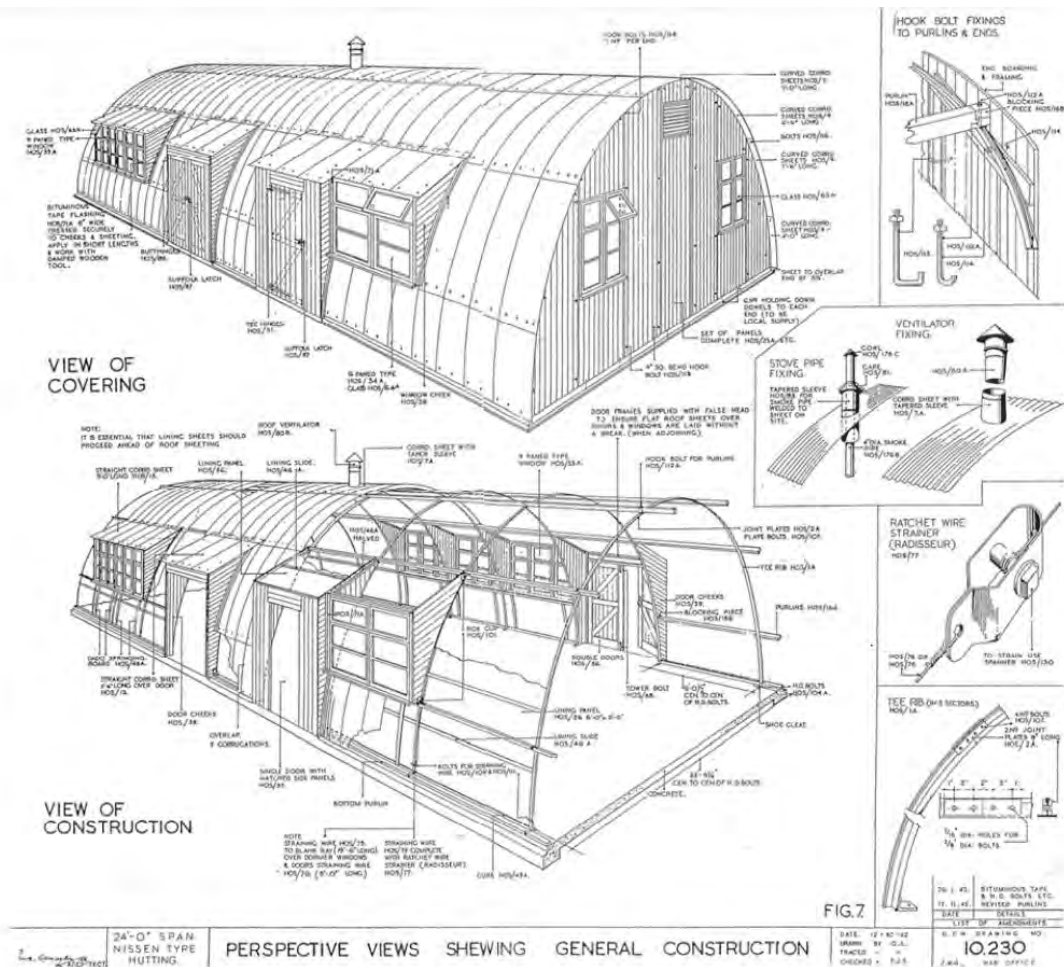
Perspective view illustrating the typical construction of a 24' Nissen Hut. Note that the floor structure was either timber framed or a concrete slab depending on local site conditions
